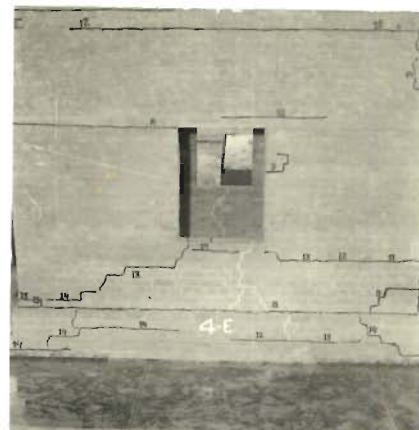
\_ BOTTOM SPANDREL OF EAST WALL MORE CRACKED (MODEL 4)
